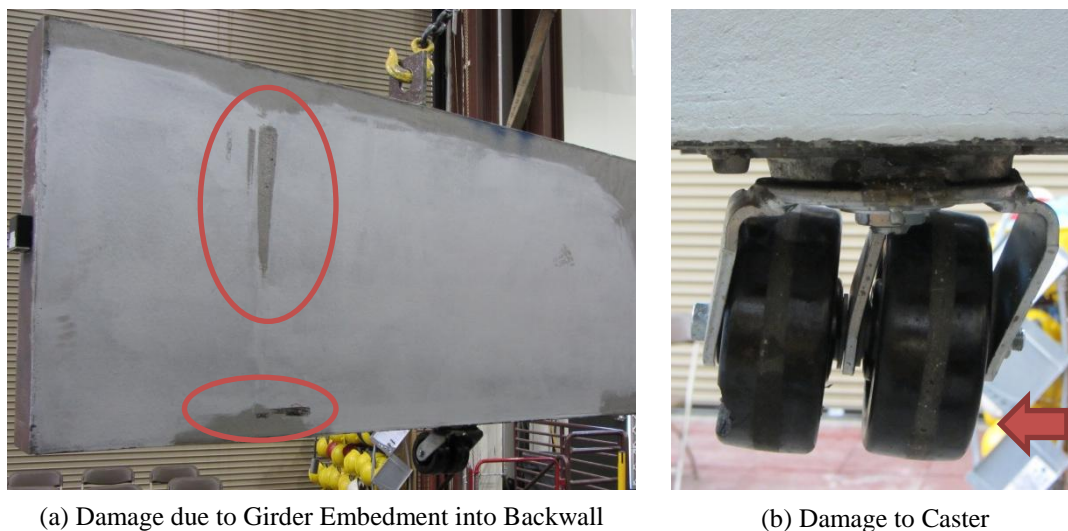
Observed Damage to South Abutment Backwall
